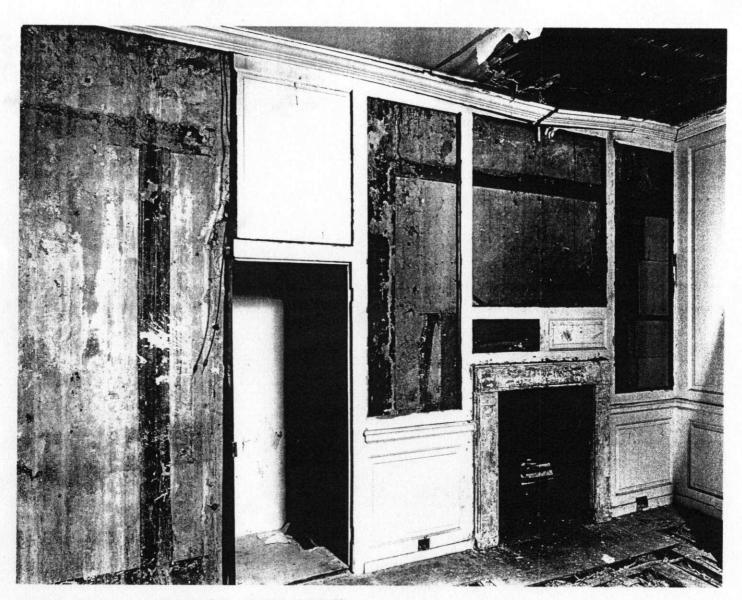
Gatetower Painted Room, West Wall (Courtesy of RCHM)
